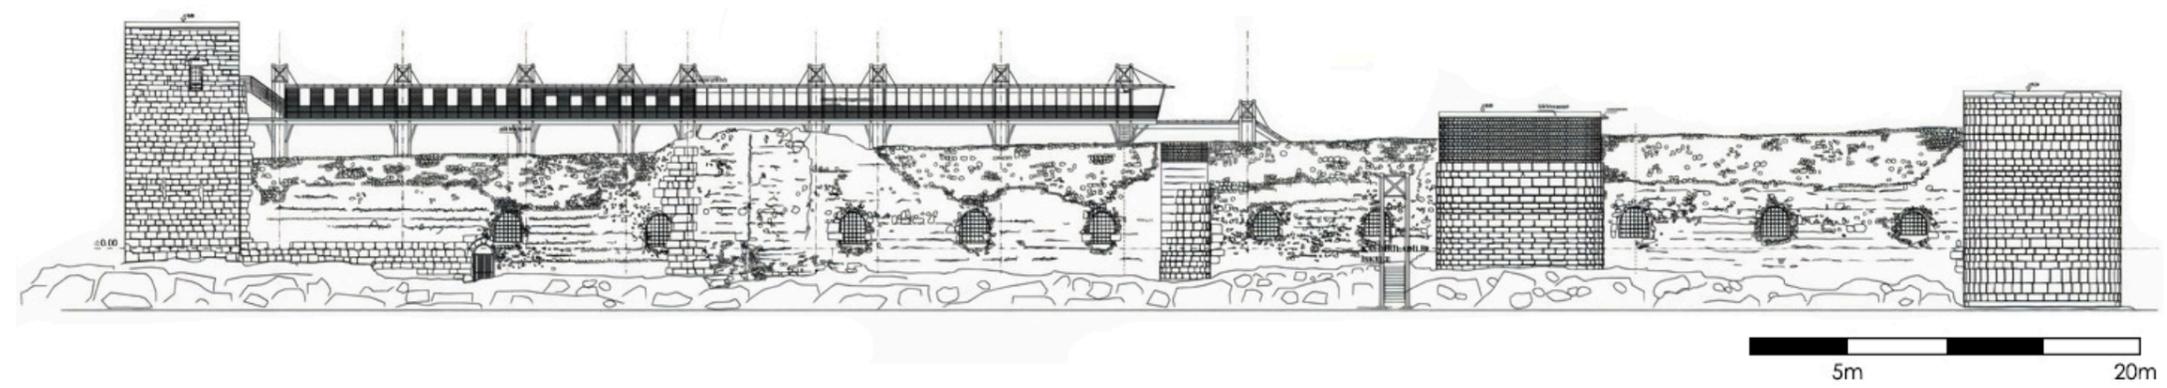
North elevation of the castle, restoration drawing (Source: Miyar Mimarlık Mühendislik, 2020)
